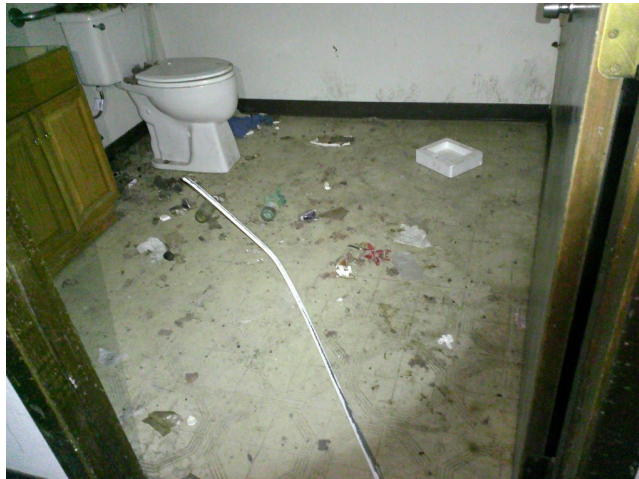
1414 West Fremont Street building 4" brown/black baseboard with tan mastic and self-adhesive rolled flooring.
